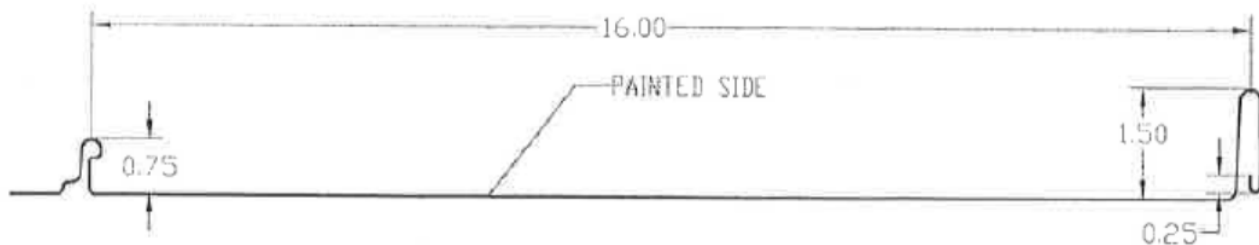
511 UNIVERSAL STANDING SEAM STEEL ROOF PANELS
